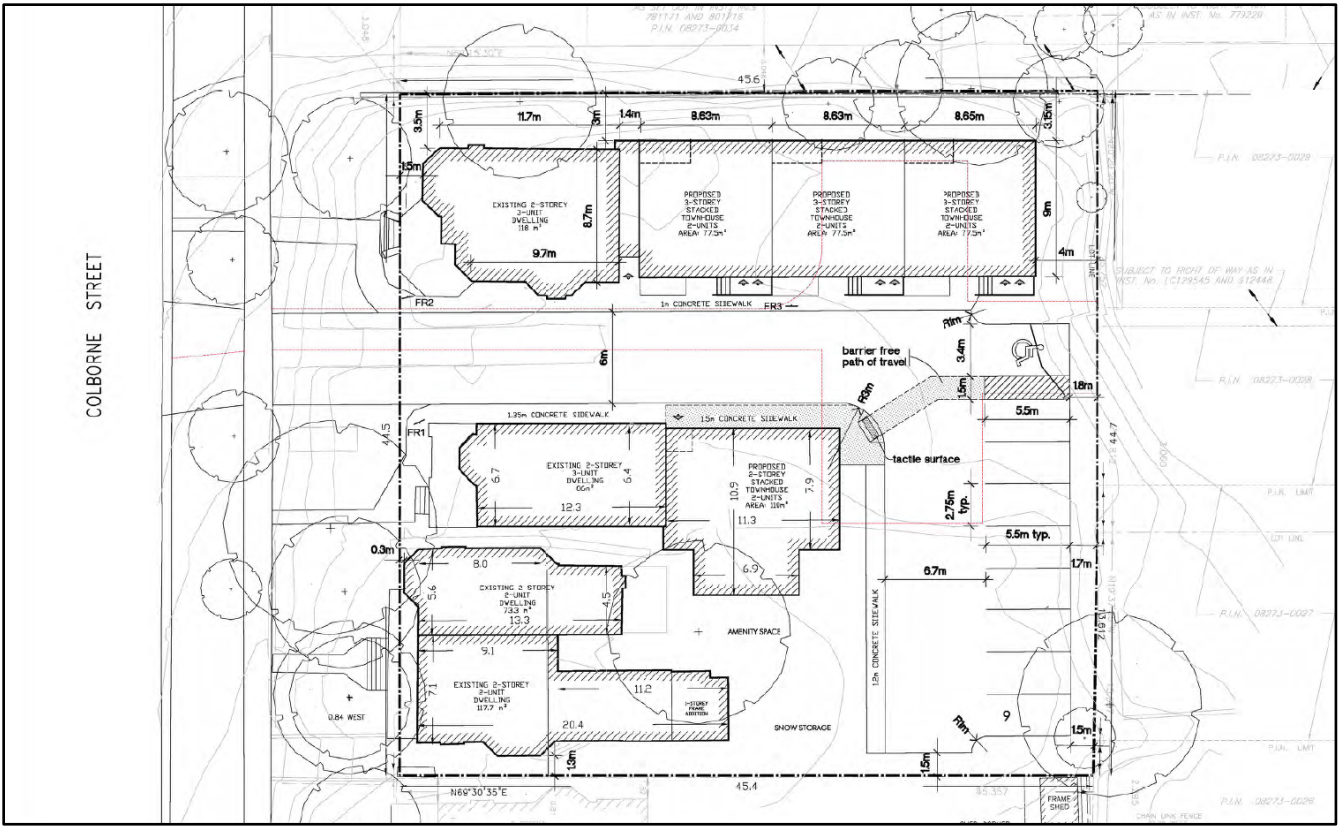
Conceptual Site Plan (Received July 15, 2024)
